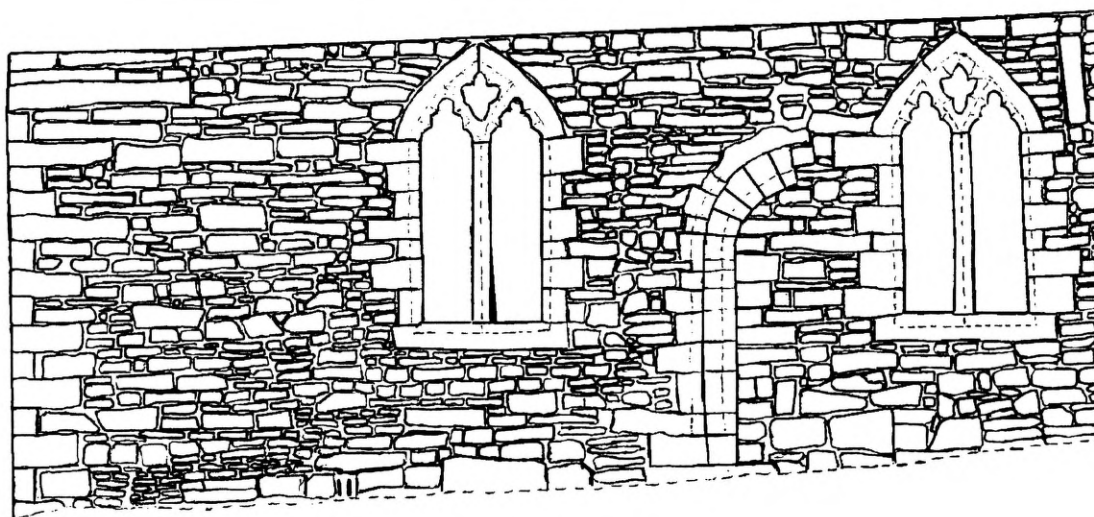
A South aisle wall, external; remains of a door in the south wall of the south aisle, west end
